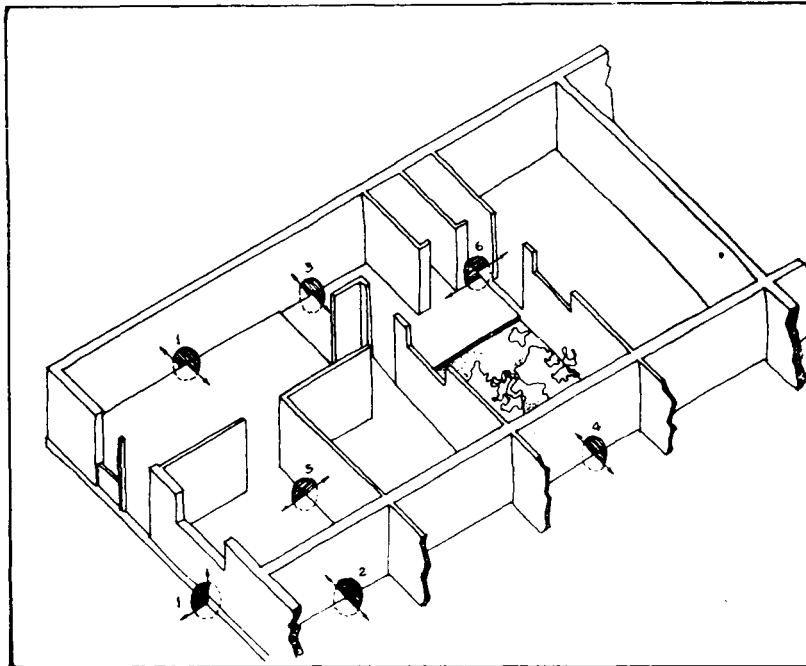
Isometric view of plan under study, on which have been indicated the points of the foundation to be studied in detail.
